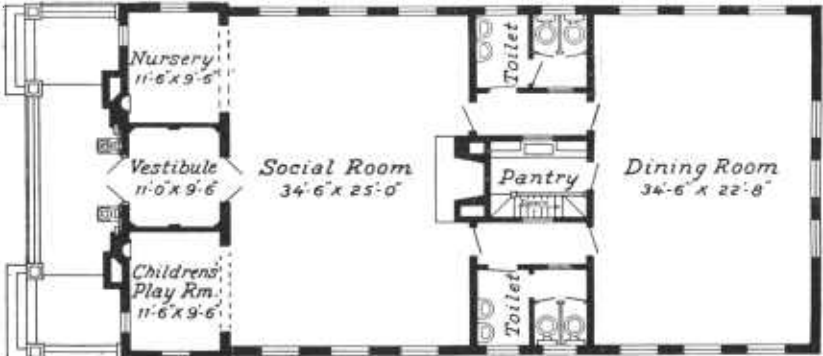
Floor plan of Seymour building. (By courtesy of John Bacon Hutchins & Sons, architects.)
